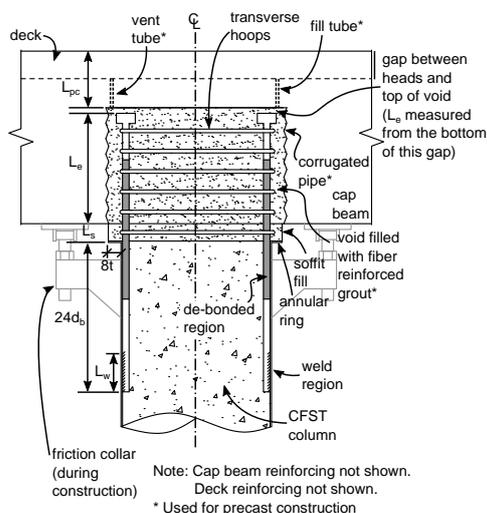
Welded Dowel Connection with Debonded Dowels
